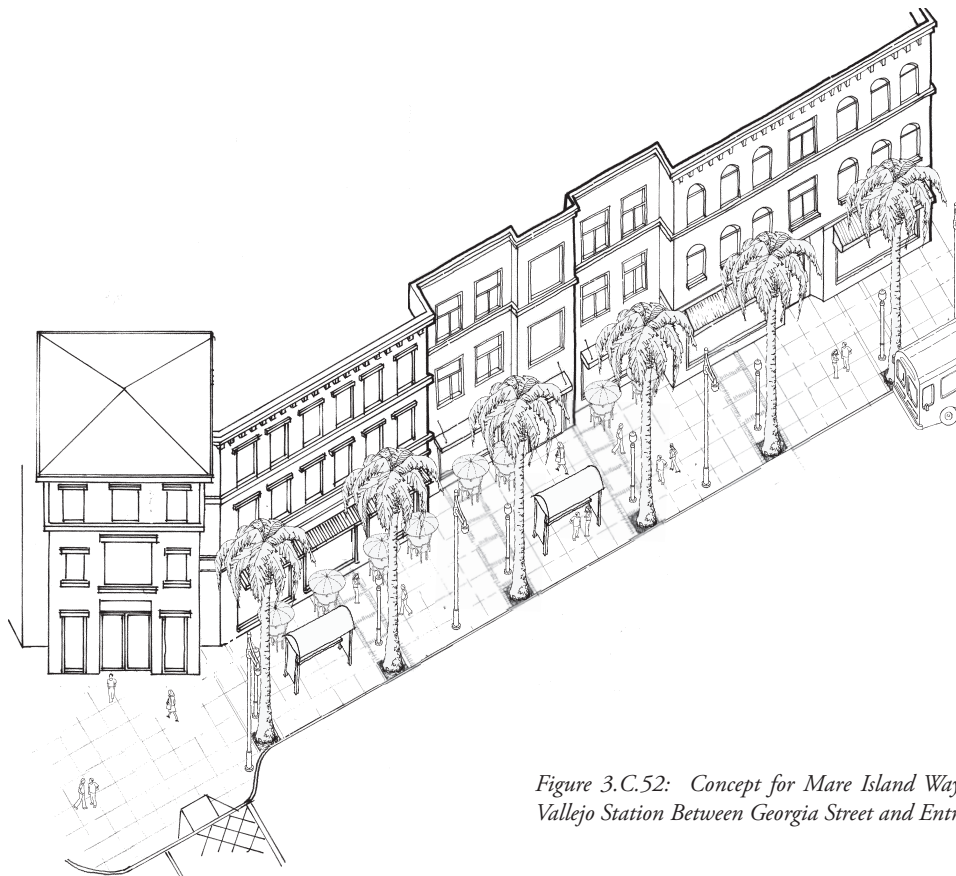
C.52: Concept for Mare Island Way Streetscape Along Vallejo Station Between Georgia Street and Entry to Ferry Parking
